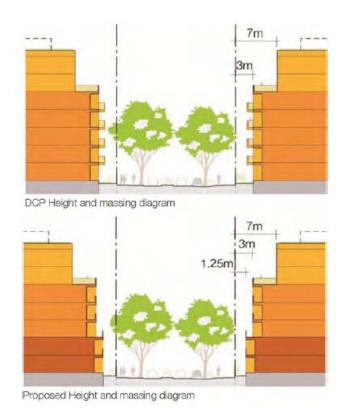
The image below shows the reduced setbacks at the ground and first floors (1.25m instead of 3m) to create a terrace form at street level.
